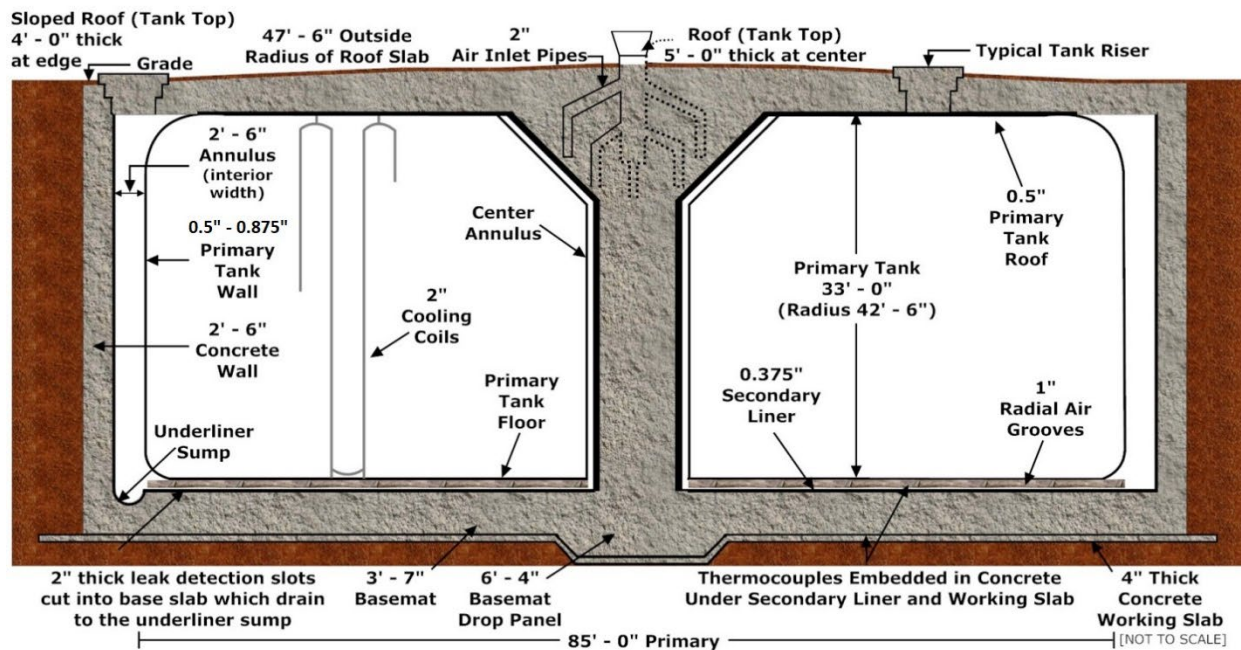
Typical Type IIIA Tank Cross-Section
